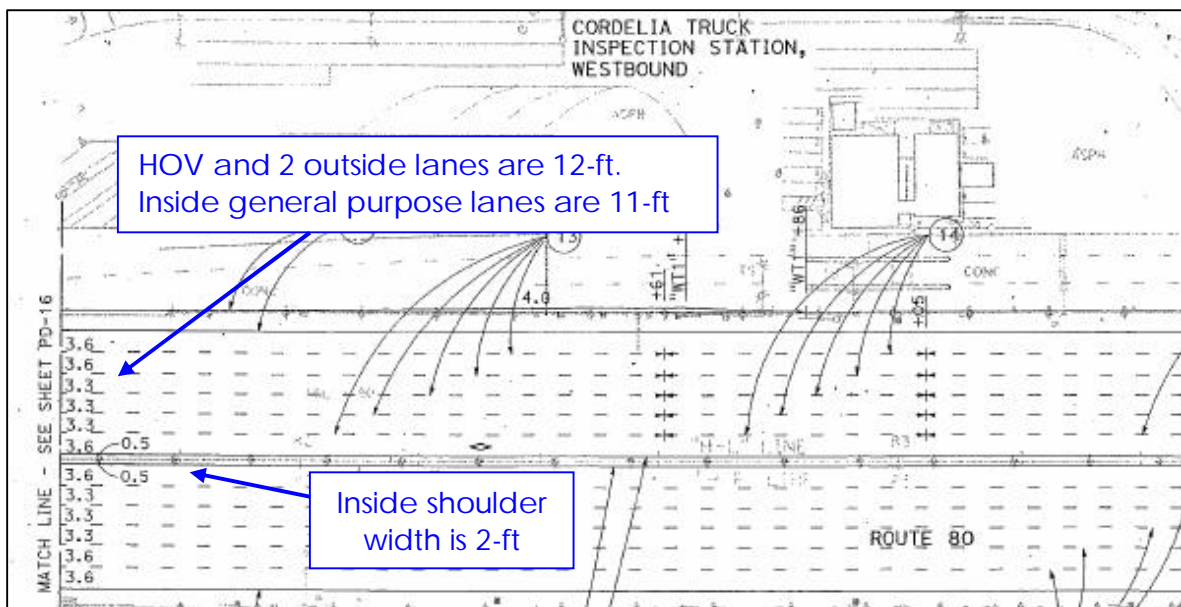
Portion of the Pavement Delineation Plan for the I-80 HOV Lanes Currently Under Construction, at the Cordelia Truck Scales
